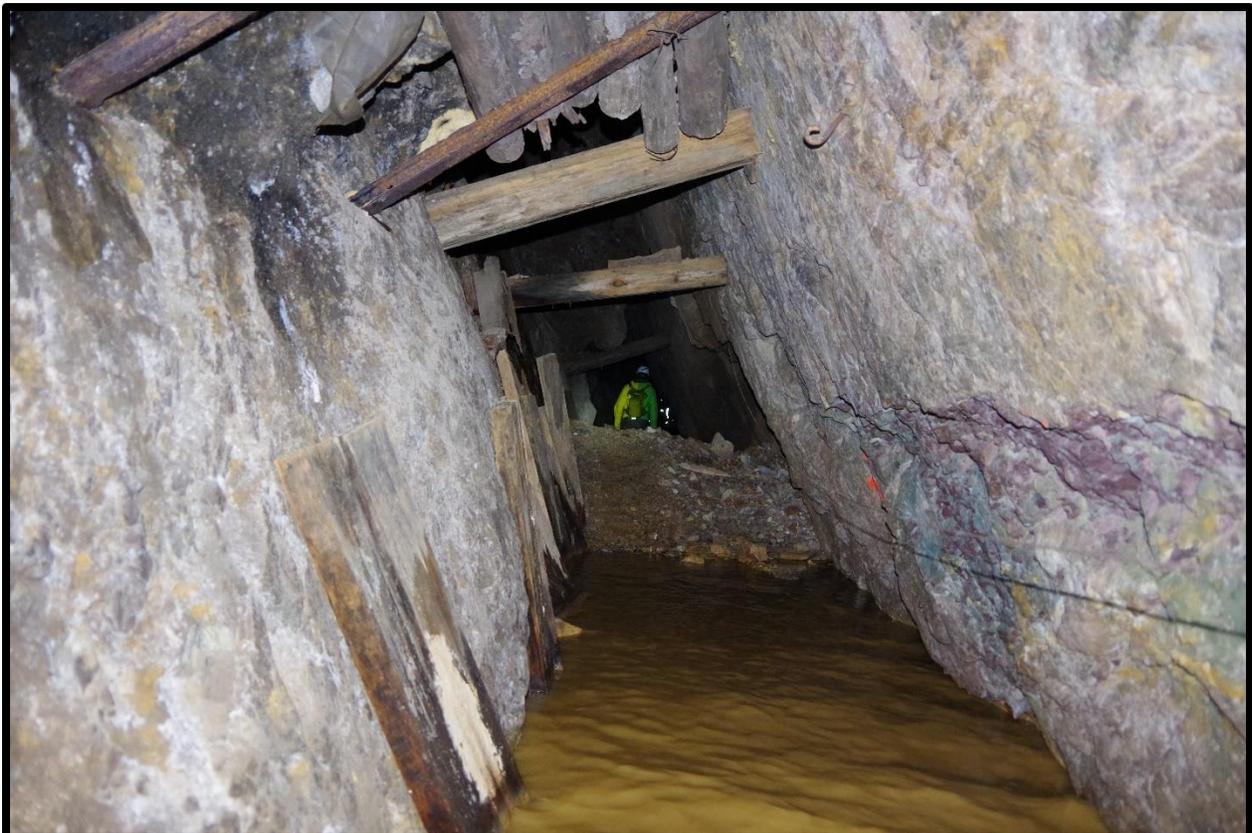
Debris pile at 44 Raise 36+82 looking outby; Note water ponded behind pile
